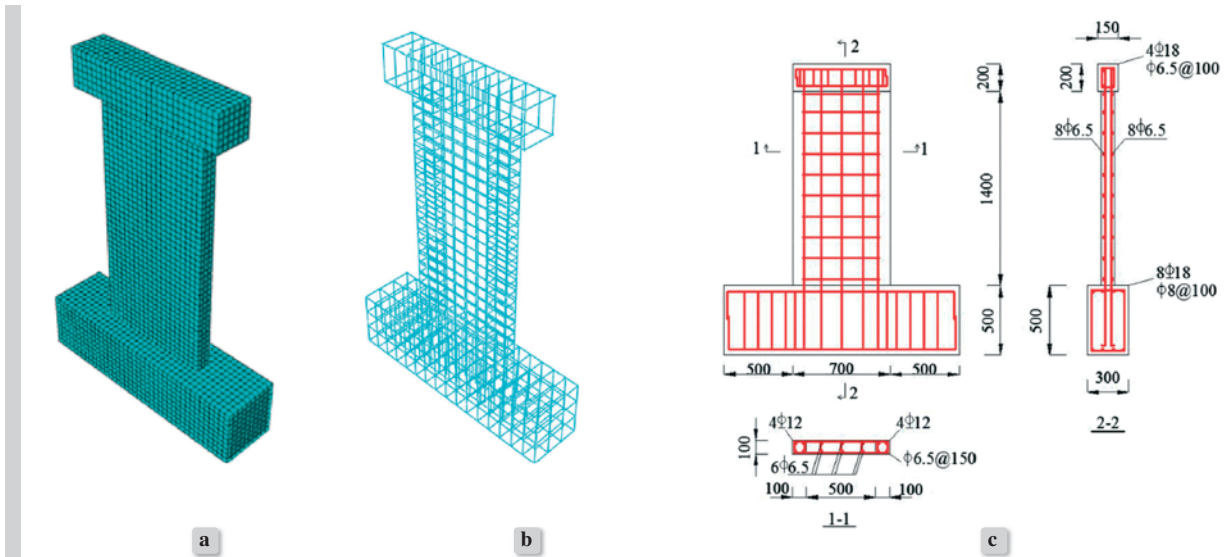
The finite element model a) shear wall b) reinforcement bars c) geometries and reinforcement details of analyzed shear wall [40]
